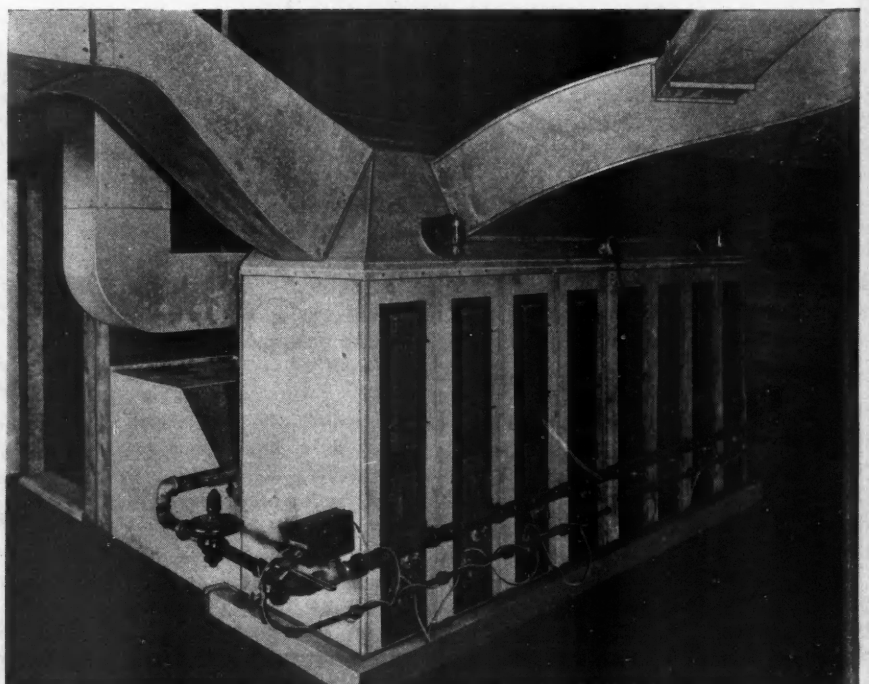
Front View of a Gas Fuelled, Warm Air Furnace Installed in a Large, New House, Showing How Clean This Type of Heating System Can Be.
